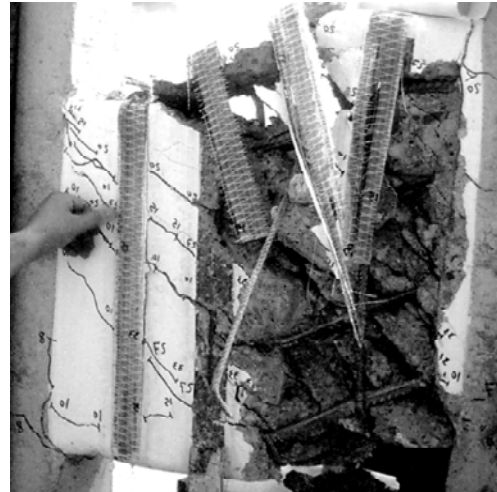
Crack pattern in Specimen P1-RE after complete failure.
